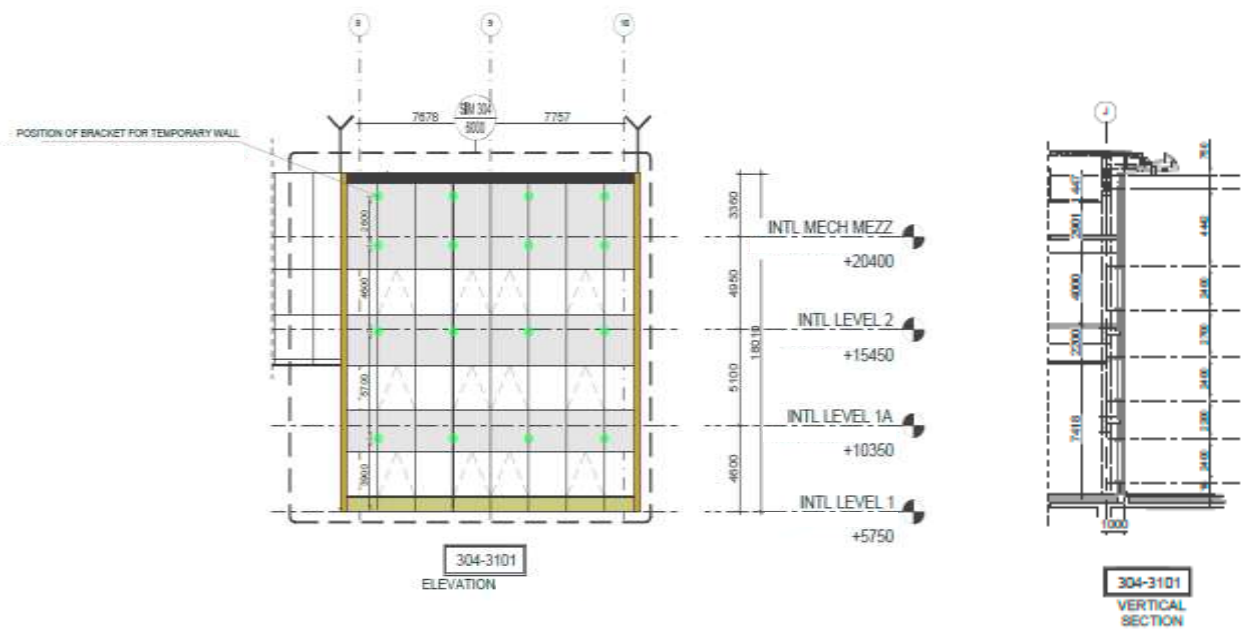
Fragment of the Facility façade from the EXPO boulevard side with fasteners.
